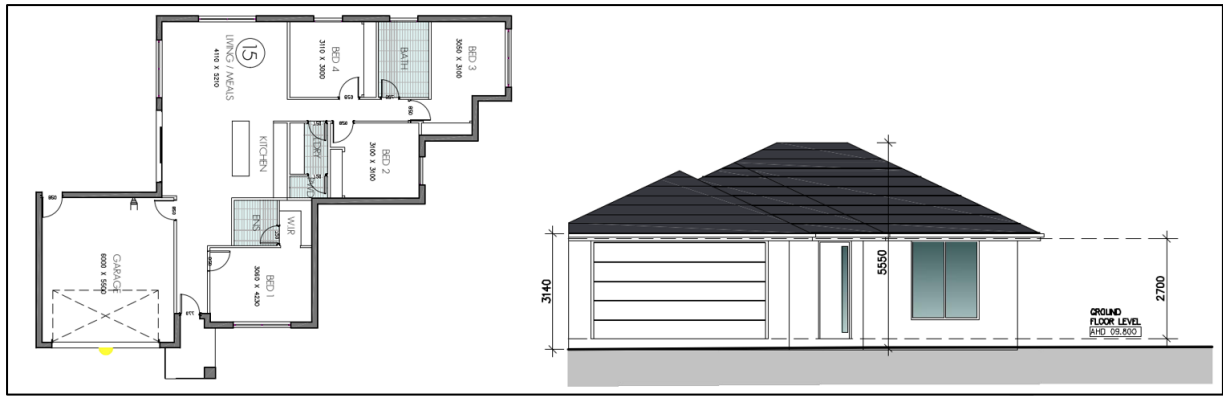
(above): Layout F Unit floor plan (left) and front elevation (right). Source: Application documents.
